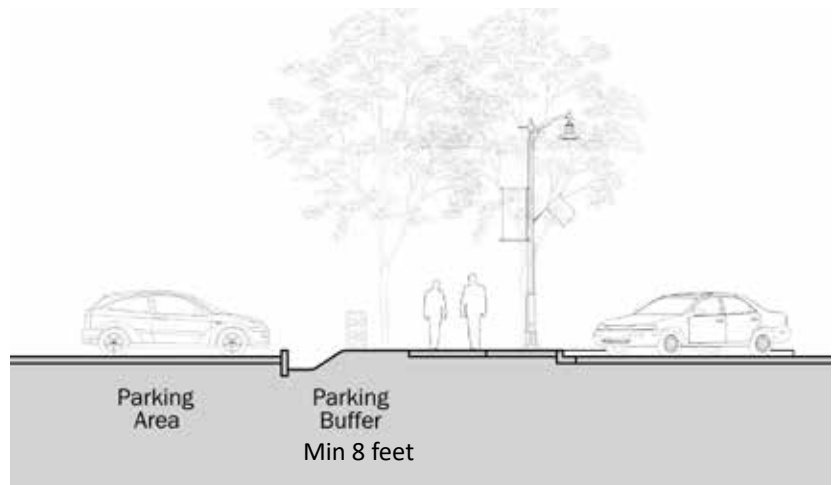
S5.a: Potential design of parking area perimeter screening landscaping, with ground level plantings, trees, shrubs and a low wall.
